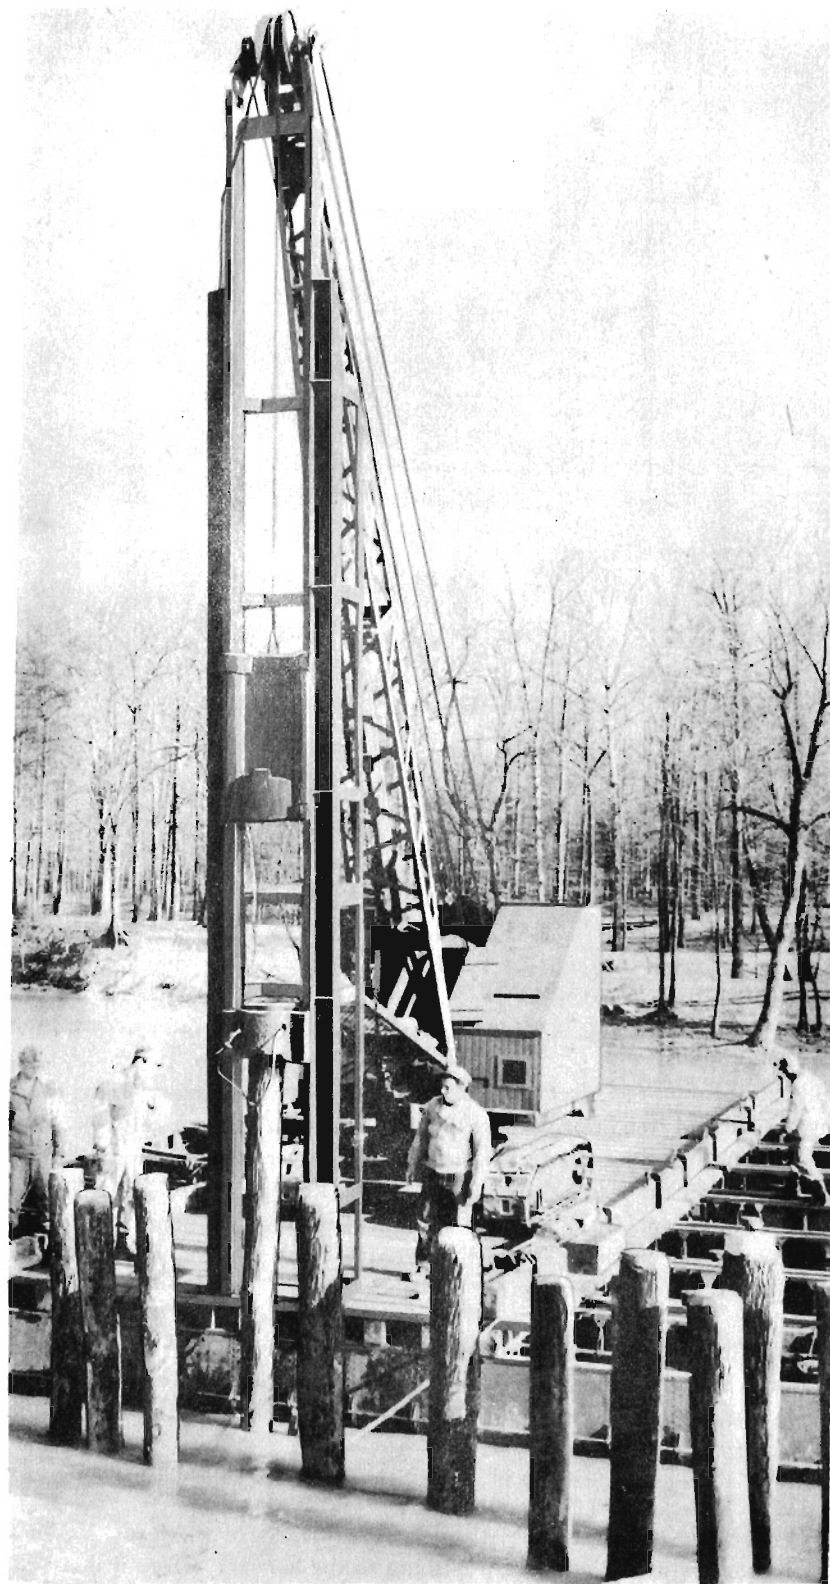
Shovel with crane boom and standard pile-driving attachment driving timber piles.
